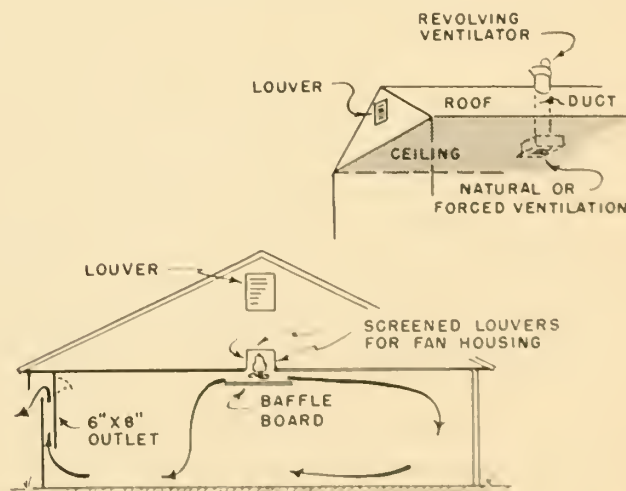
Fan blowing air from attic into laying house in winter. Upper right, alternative arrangement, with fan mounted in ventilation stack or duct.
